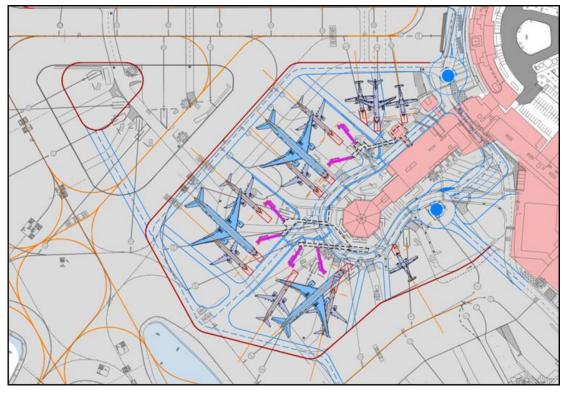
Terminal 1 Piers - New Airbridges (6NBE / 3WB)
